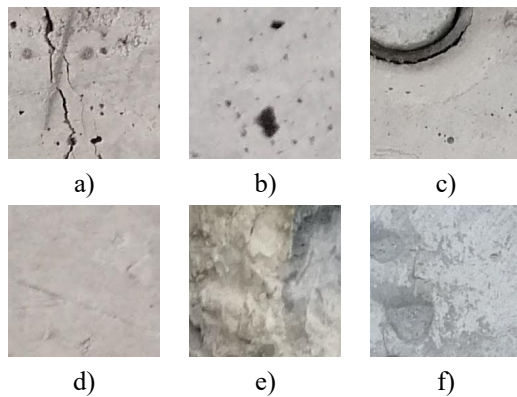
Example of concrete surface texture complexity, where a) dirt, b) bugholes, c) formwork marks, d) mechanical damage e) background obstructions f) troweling marks (Tomaszkiewicz & Owerko, 2023b)
